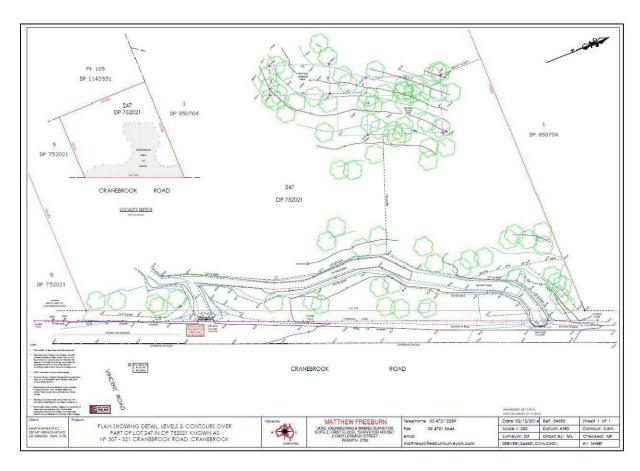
Potential lot layout at 307-321 Cranebrook Rd, Cranebrook NSW
